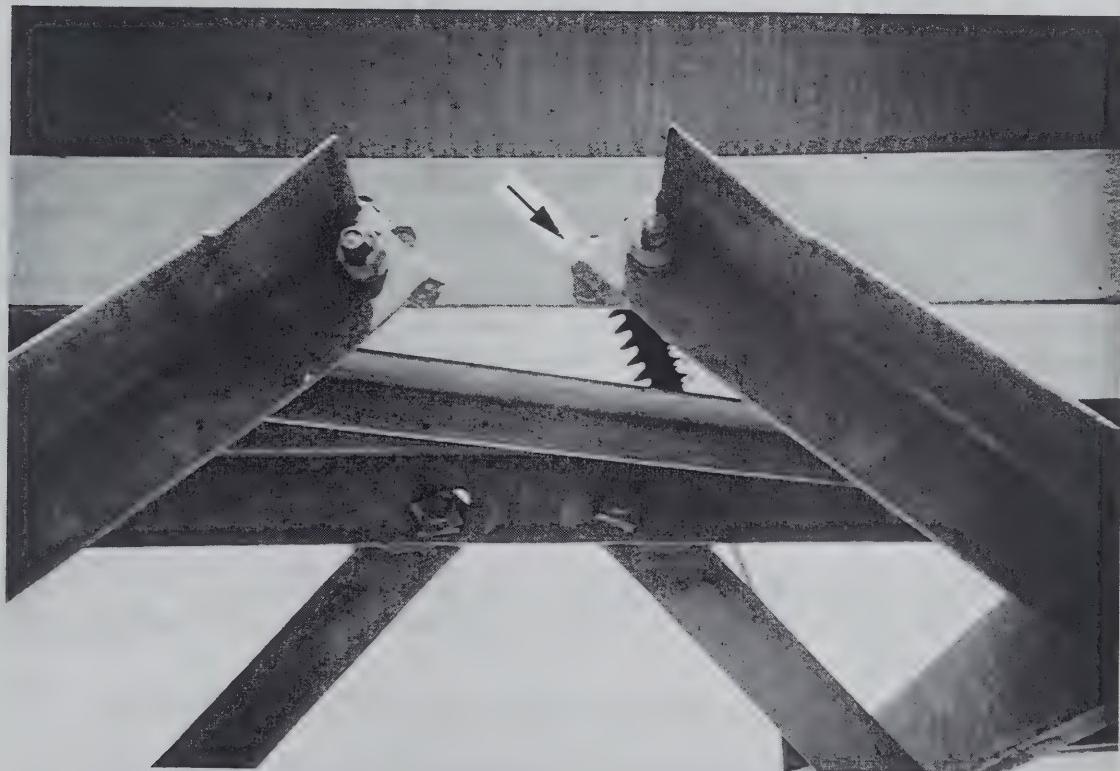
A detail of a support structure that shows a slotted connection that was welded after the structure was assembled.
